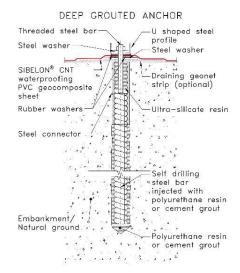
Deep grouted anchors used at the Panama Canal Water Saving Basins and at Ambarau dam
